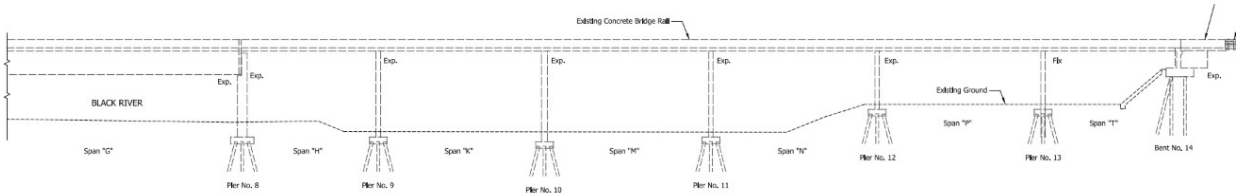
Elevation View of Spans 7-13 of the Bridge (NBI 33240) (2015)
